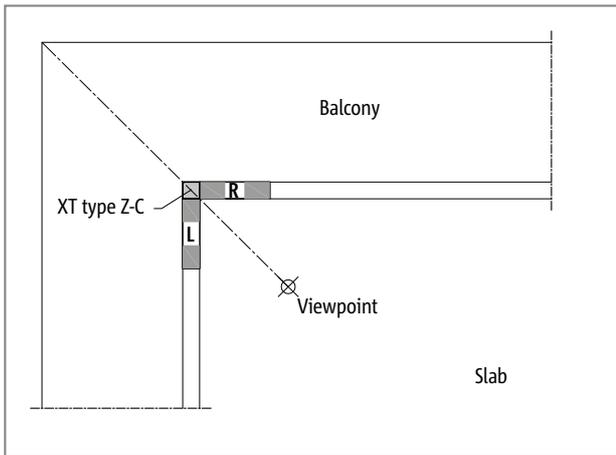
Schöck Isokorb® XT type C: Arrangement XT type C-L left from viewpoint, arrangement XT type C-R right from viewpoint
